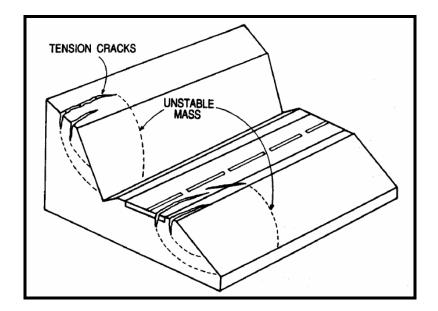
Development of tension cracks at top of roadway or cut slope (FHWA, 1988)
